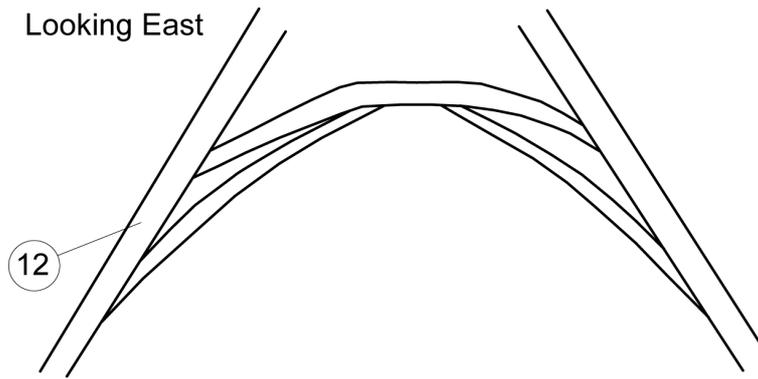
Sketch showing the location of sample SWM-F12 from truss A in the hall range roof
